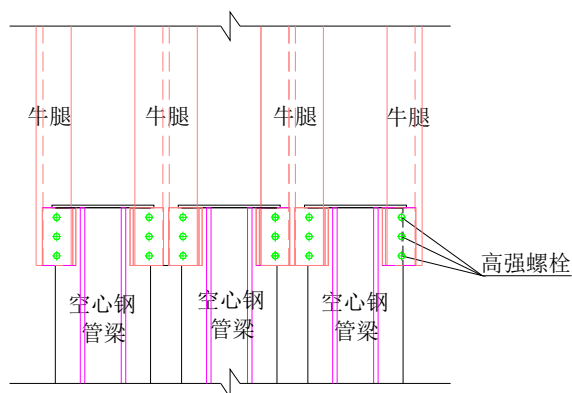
The connection diagram of hollow steel beam and concrete filled steel tube column bracket
